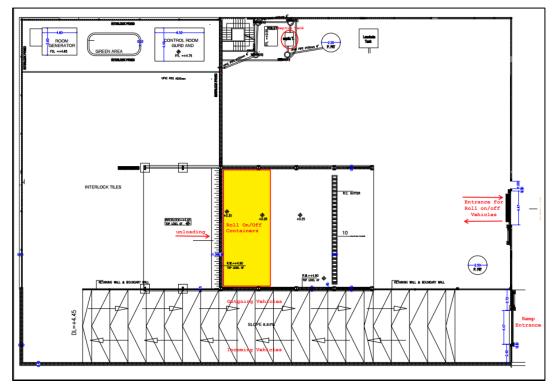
Layout and elevation of the transfer station in Khan Younis(UNRWA, 2016)
